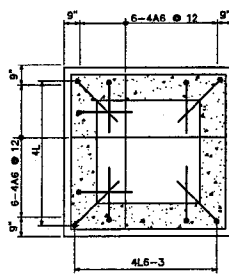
TYPICAL SECTION FOR ACCESS TO SPILLWAY 3/16" = 1'-0"
